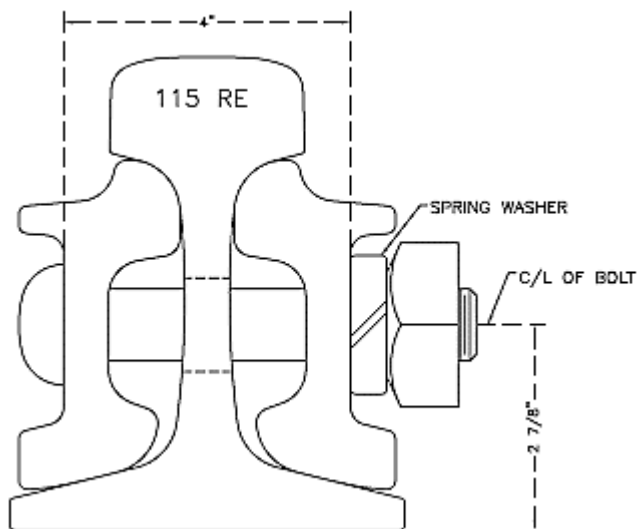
Figure SUB-PART D – 57 – Clearance Joint Bar Assembly for 115 RE
